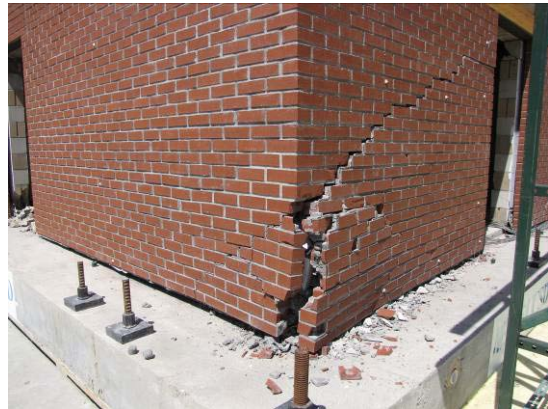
Damage to southeast corner (2nd Tarzana 150 %)
